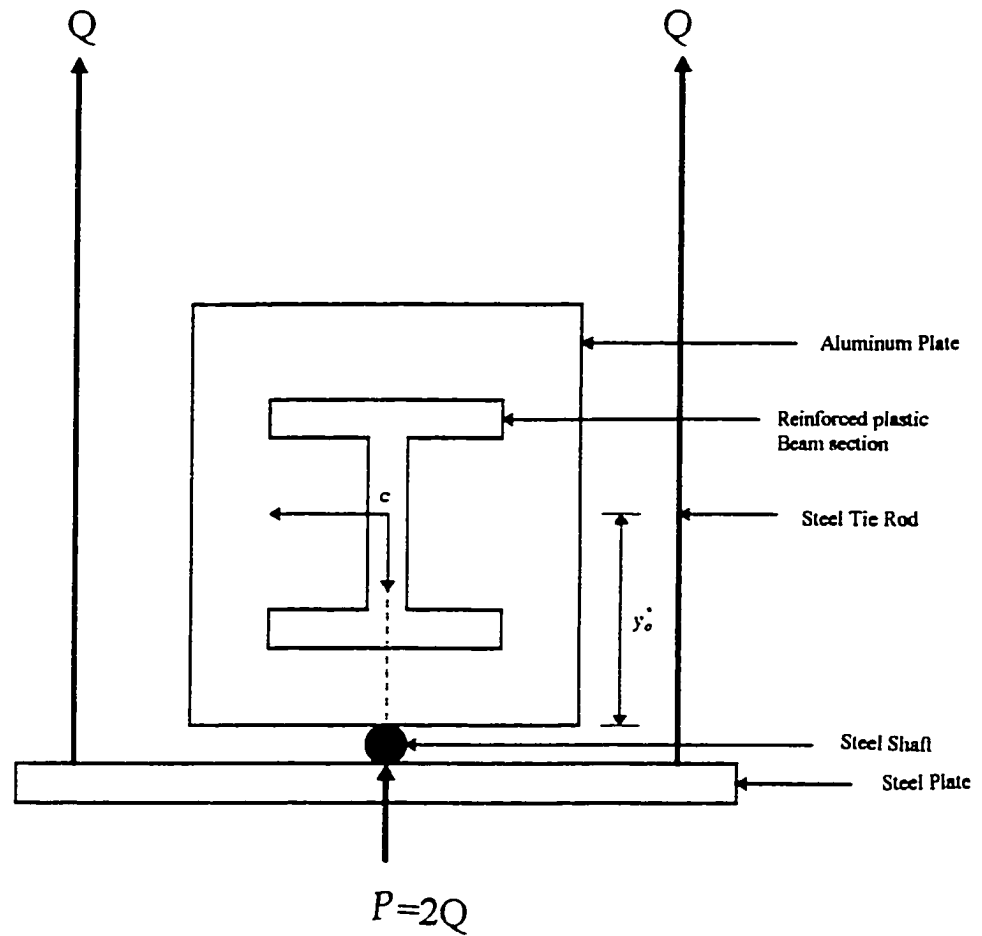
Cross-sectional schematic view at load application points for I-section beam
